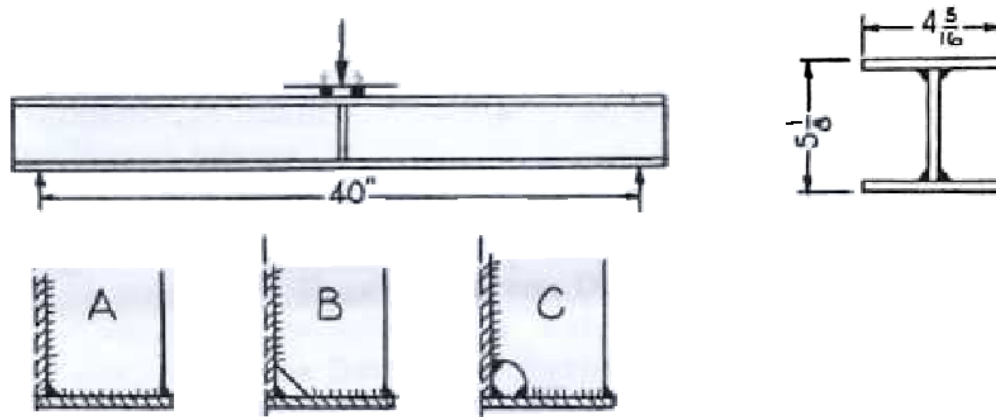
Wrapped Intermediate Stiffener Welds
